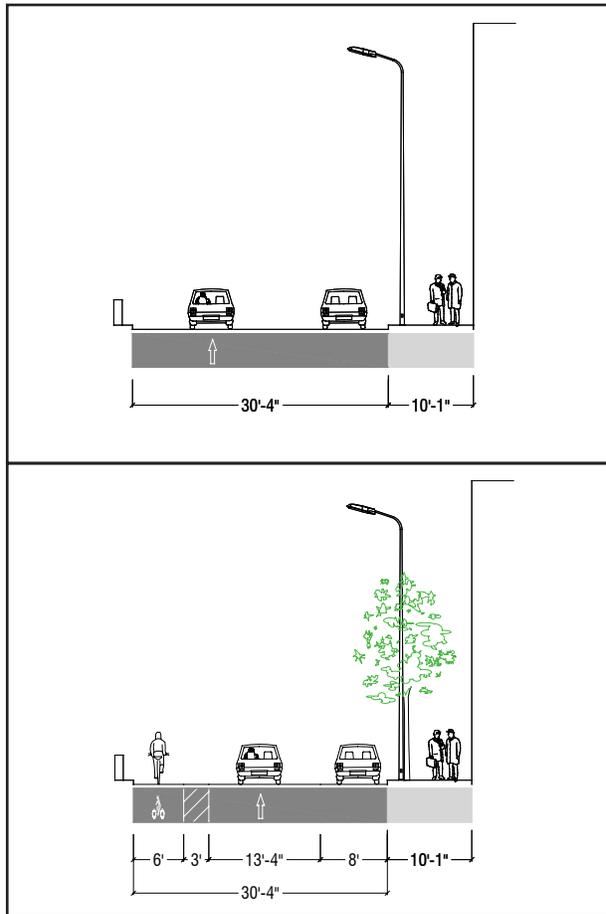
Section 3: East 135th Street northerly street segment, existing and recommended cross section (facing west)
